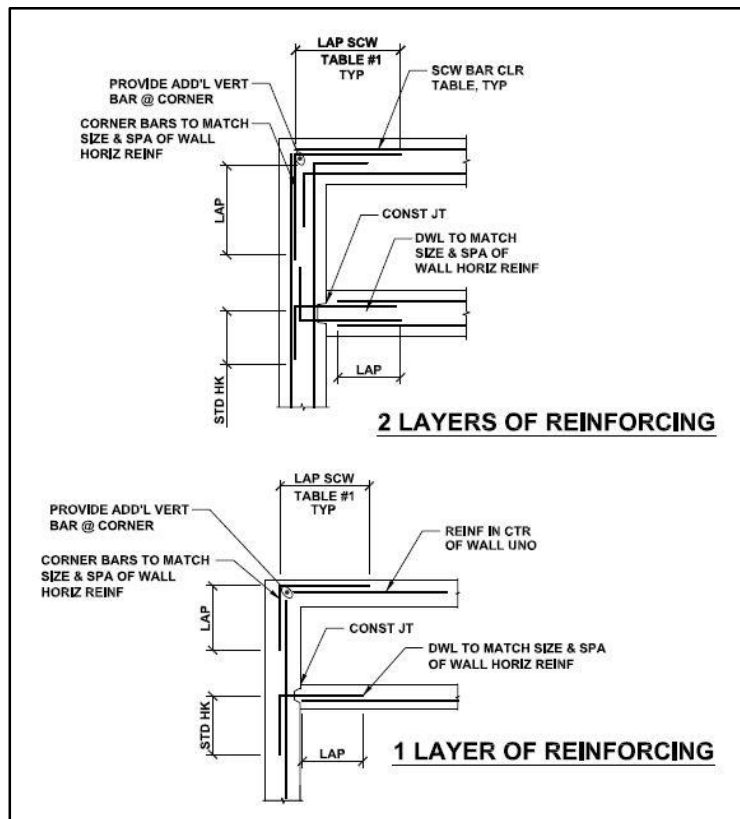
Detail of Horizontal Structural Element to Vertical Structural Element Connection
